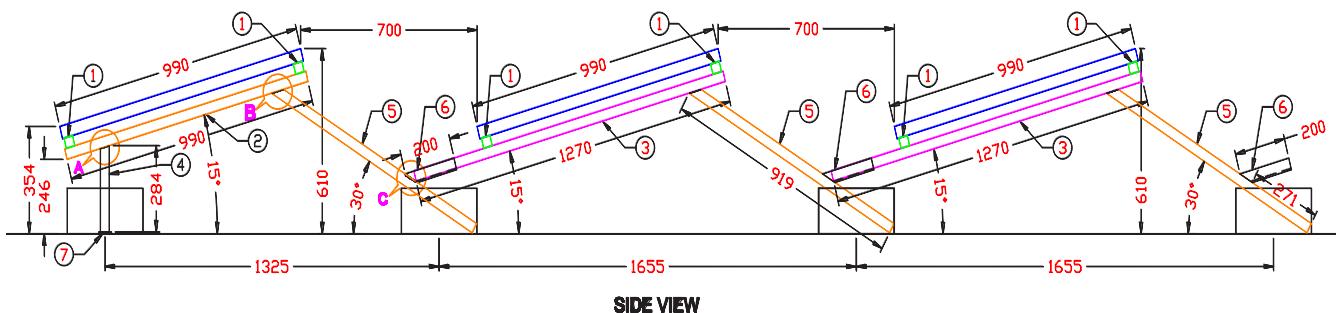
Panel Racking - Rails/rafters, fasteners (clamps)
